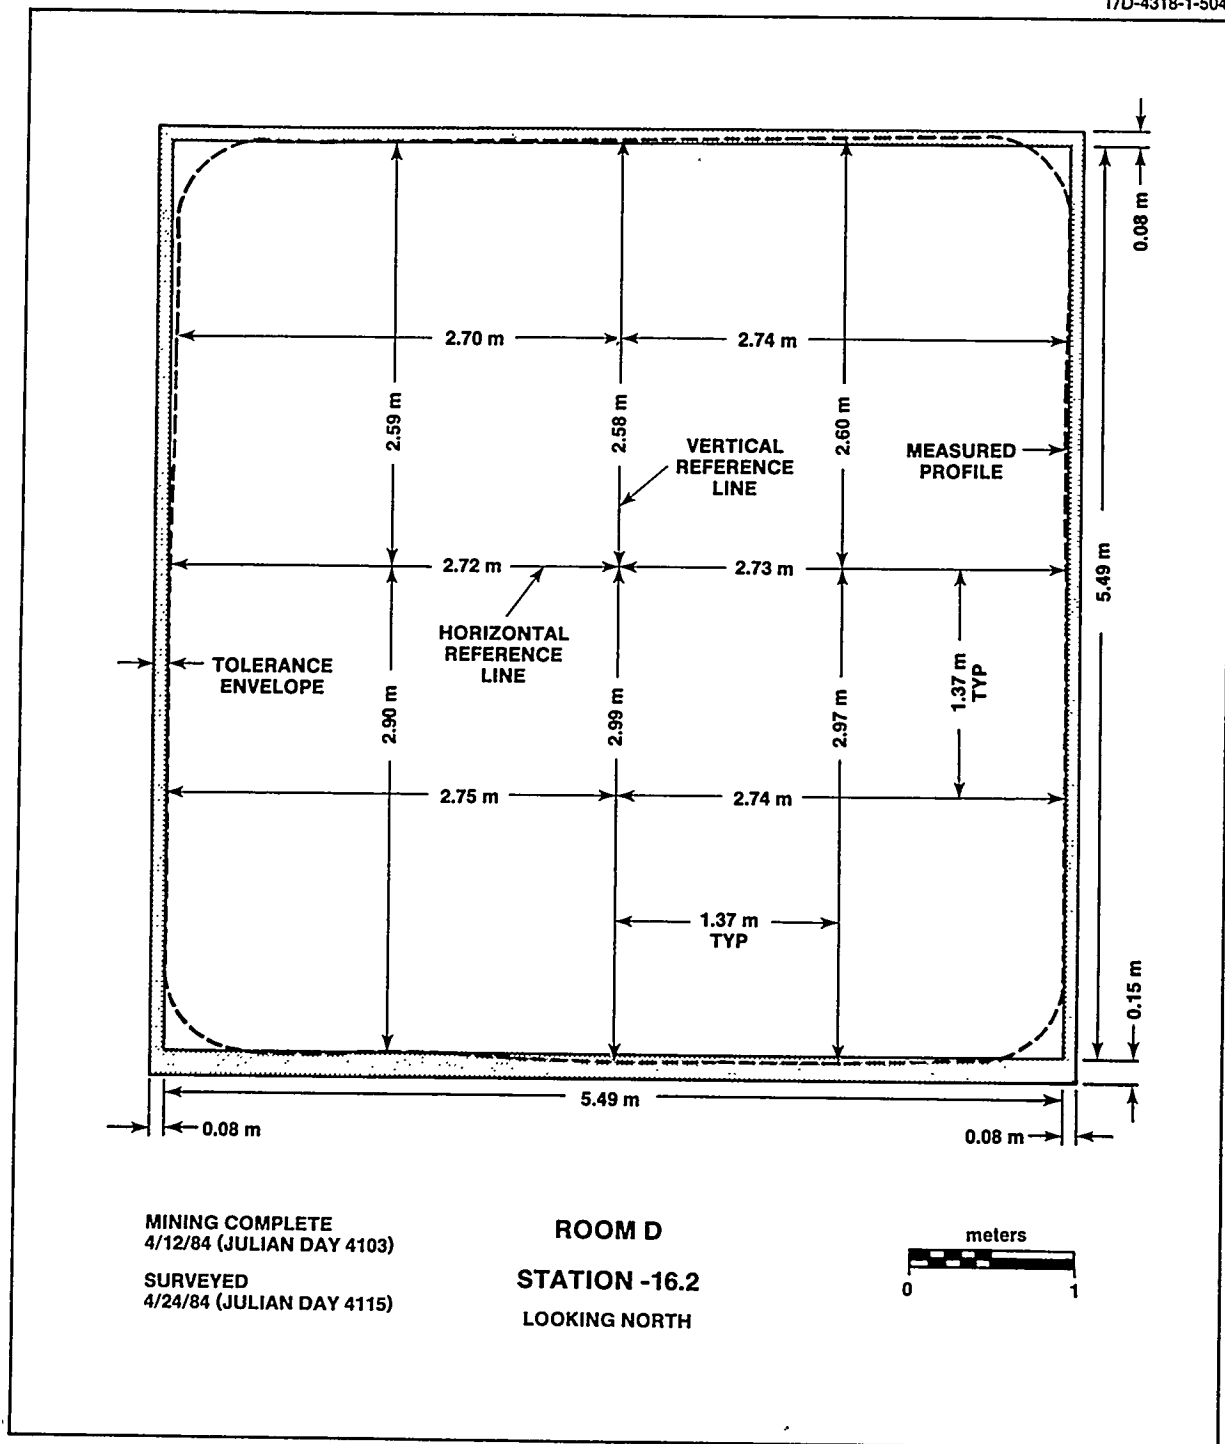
As-Built Cross Section of Station -16.2 m, Room D
